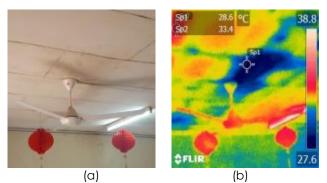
Ceiling at the ground floor main hall: (a) visible; (b) infrared thermal image
